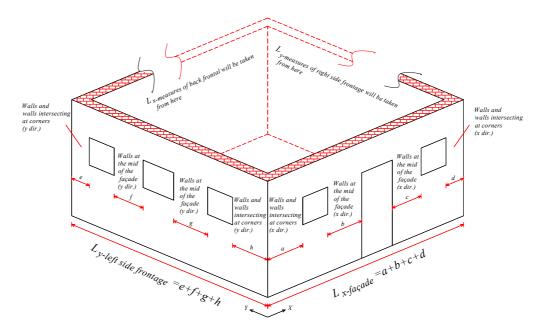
The perspective view of periphery walls of a masonry building, window and door openings and related lengths
